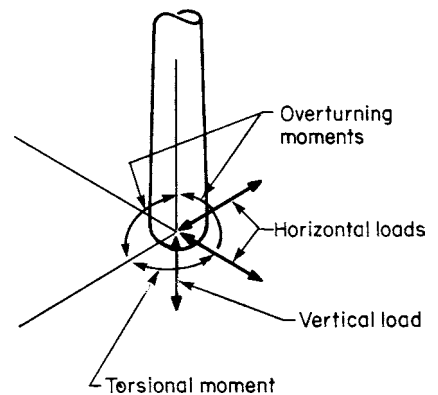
Typical loads acting on foundations for single-shaft structures.
